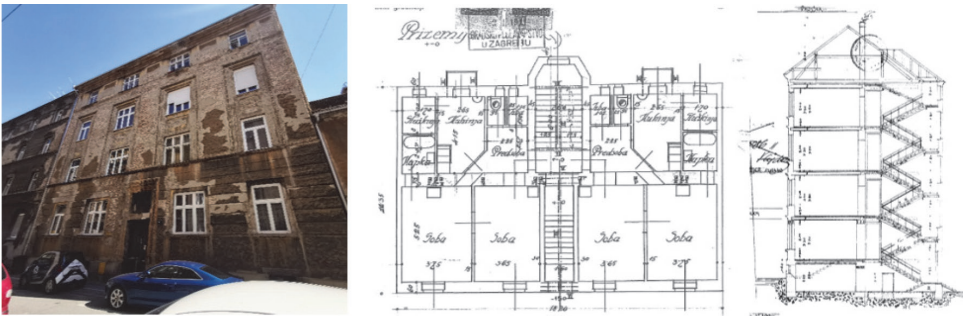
a) Case-study building in Mrazoviceva Street; b) Archive architectural drawings
